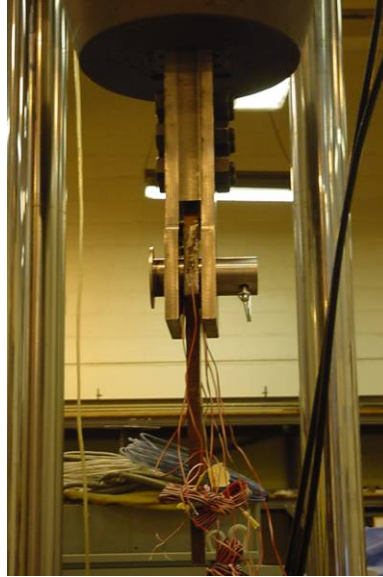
Side View of Eyebar End Connection, Pin, and Test Attachment
